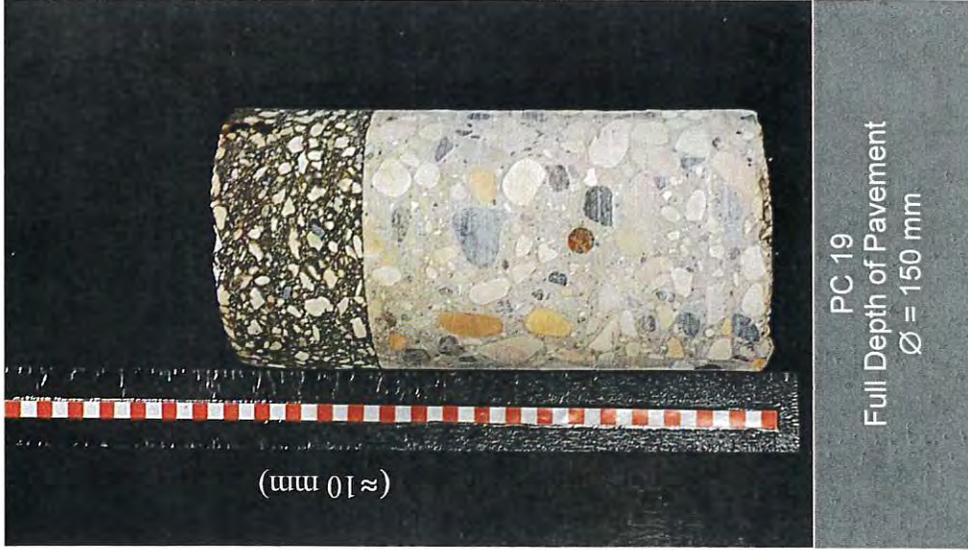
Specimen from Partridge Avenue, South Curb Lane
